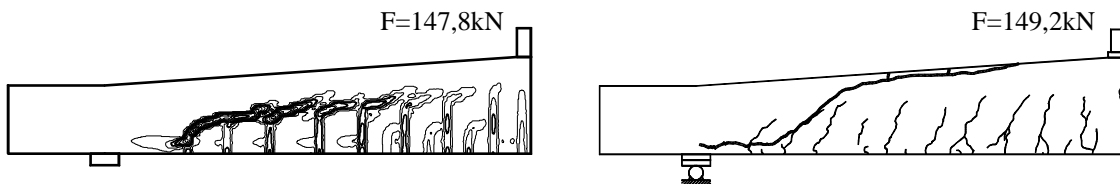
Crack propagation at failure of test beam 2L2 from Non-FEM and test
